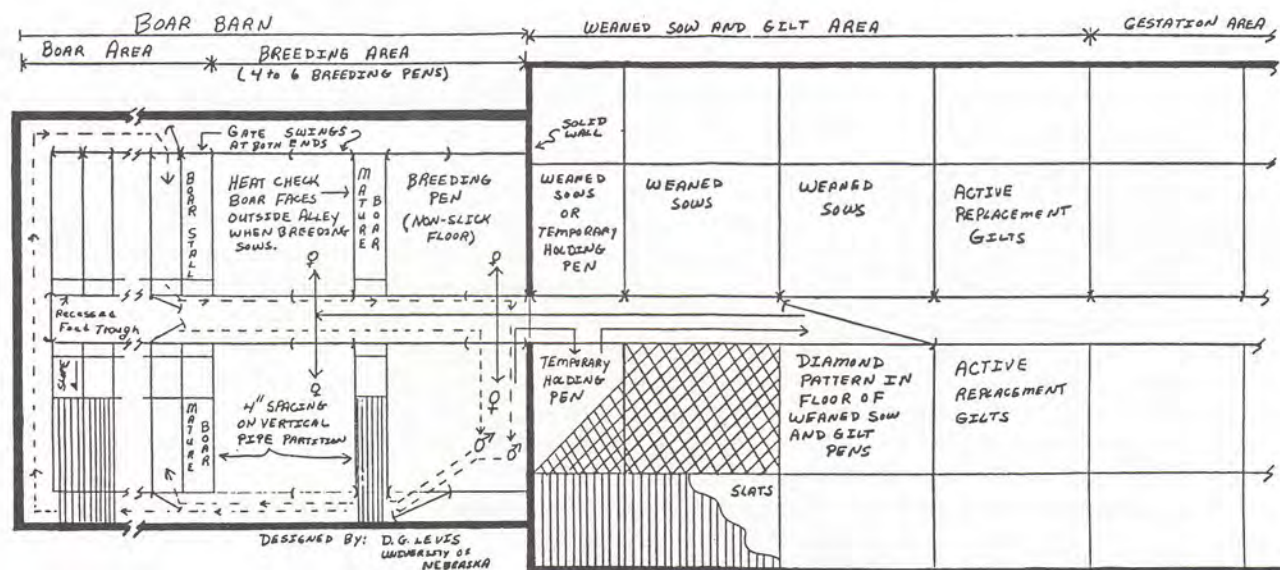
Handmating Breeding Facility When Sows Are Group Housed.
